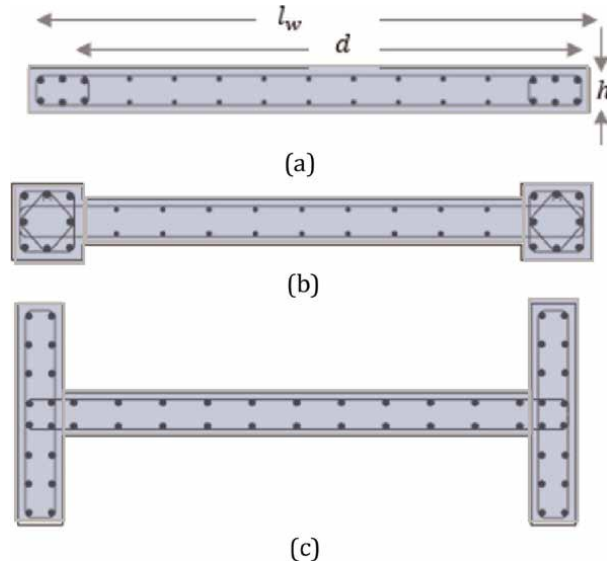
Shear wall with boundary elements. (a) Boundary element inside the wall. (b) Shear wall with enlarged boundary element. (c) Shear wall with concentrated reinforcement in wings.
